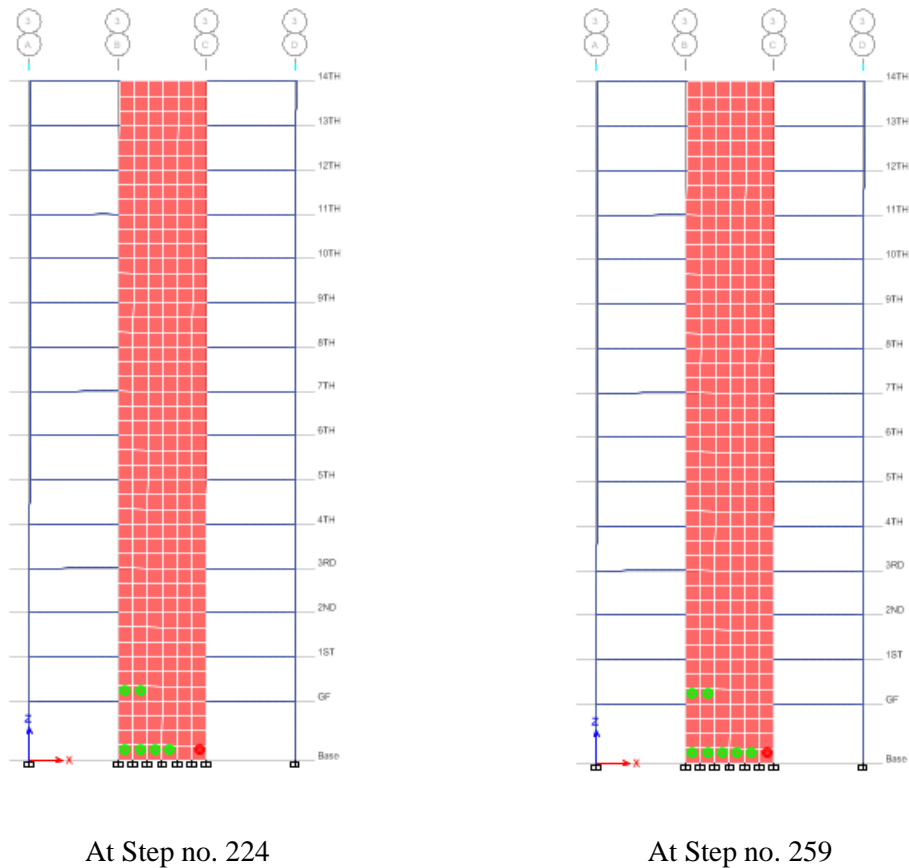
Hinges at flexural members and shear wall at different steps for plan A (M1) building
